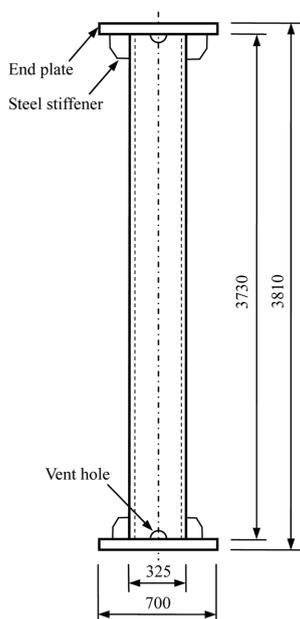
Elevation details of CFST columns prior to strengthening (Unit: mm)
